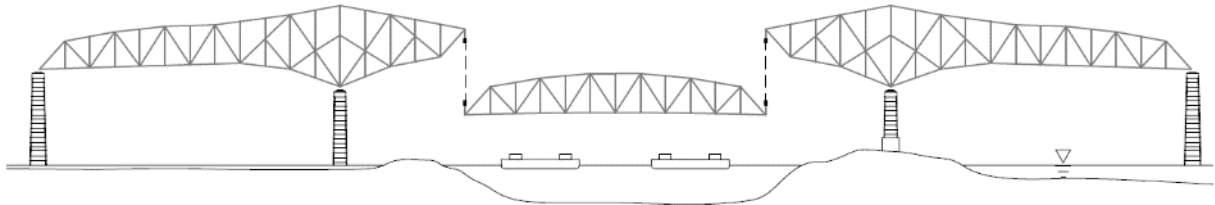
Section 6 – Strand Jack Lowering – Suspended Span
